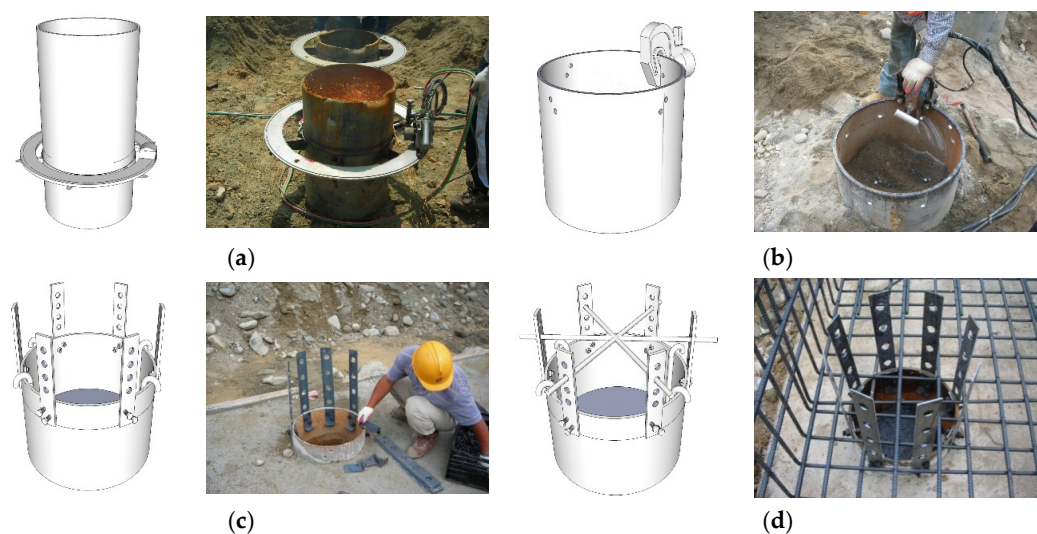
Perfobond shear connector for steel pile cap strengthening. (a) Cutting of steel pile cap; (b) Hole punching on the steel pile cap; (c) Installation of perfobond shear connectors by bolting; (d) Distribution of steel reinforcing bars at concrete foundation.
